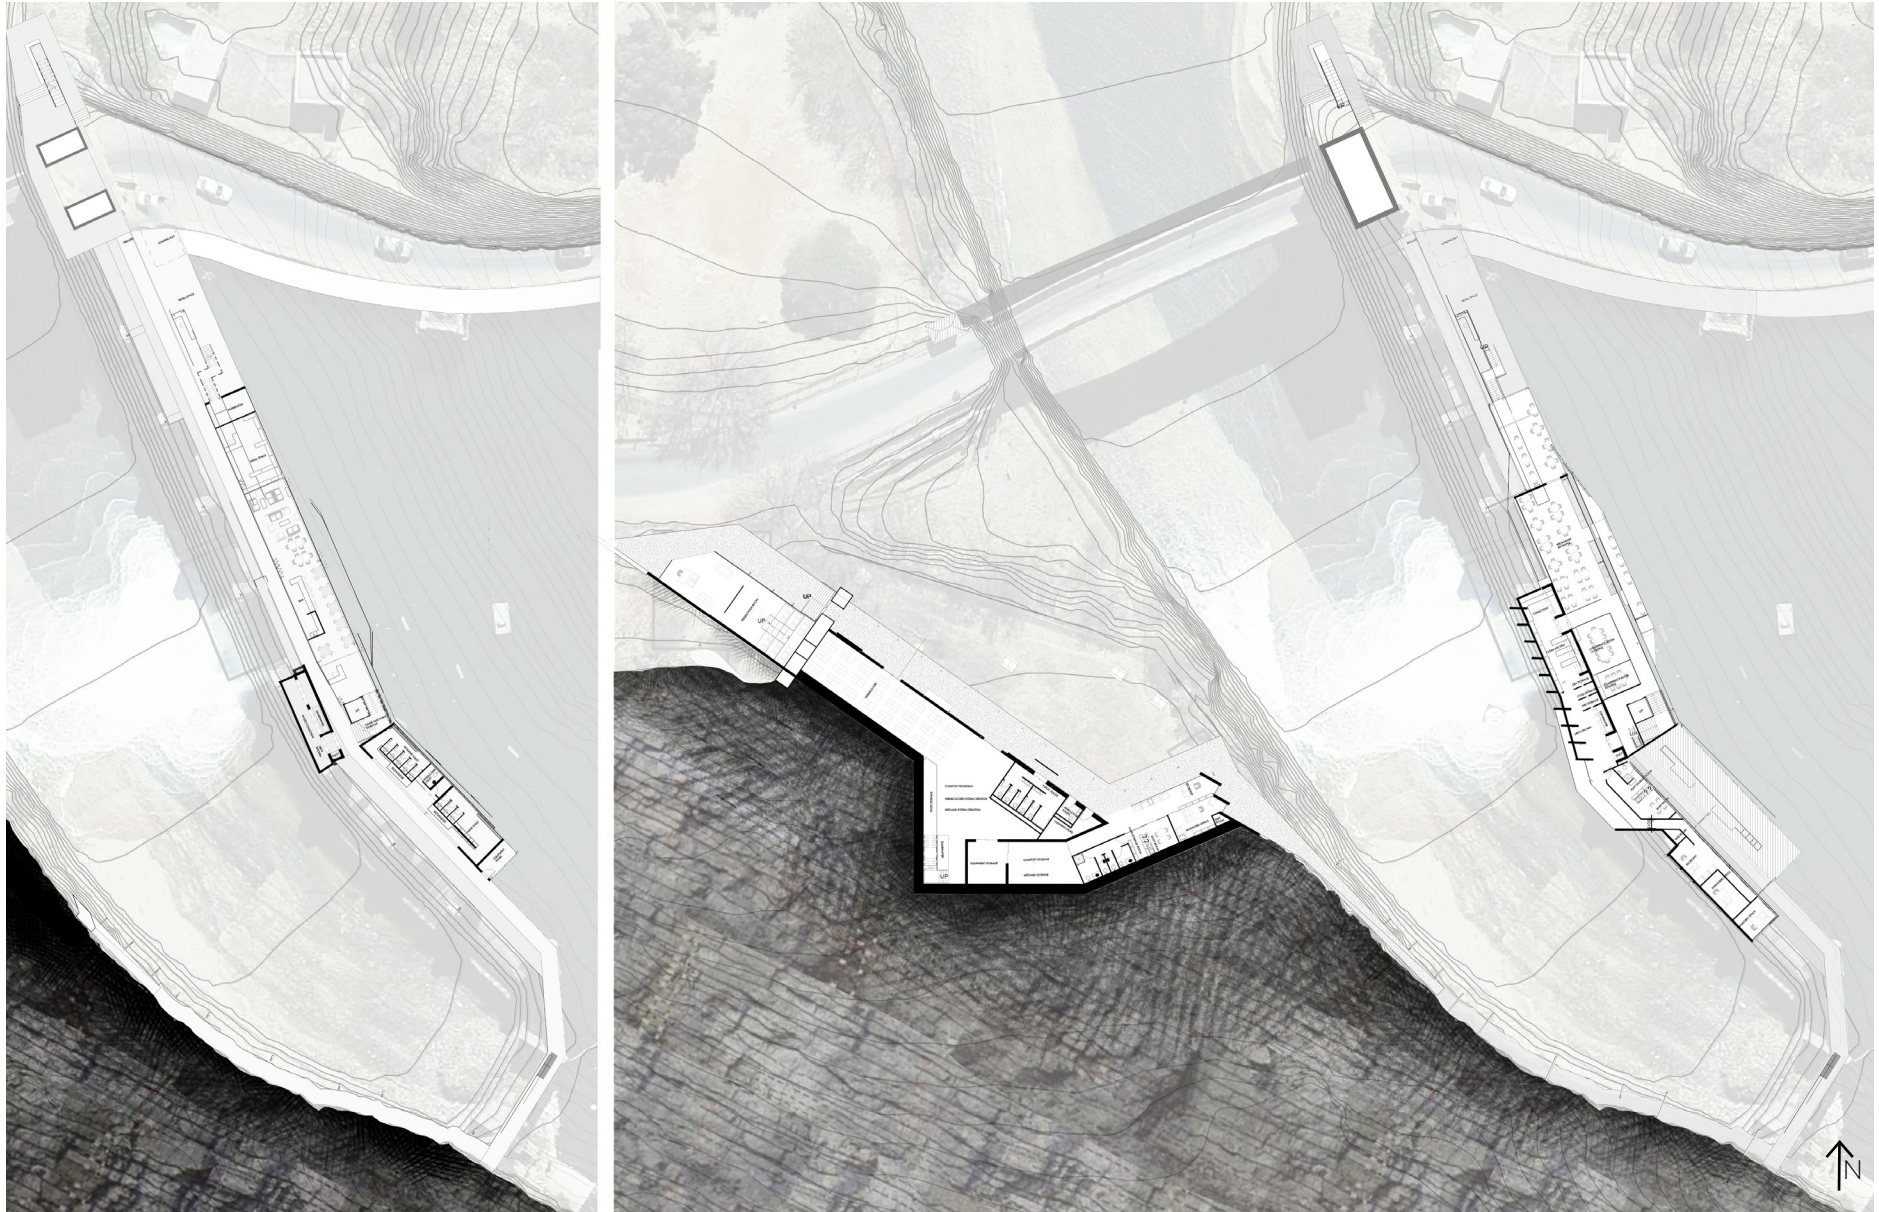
Ground floor plan and first floor plan (Author, June 2016).
